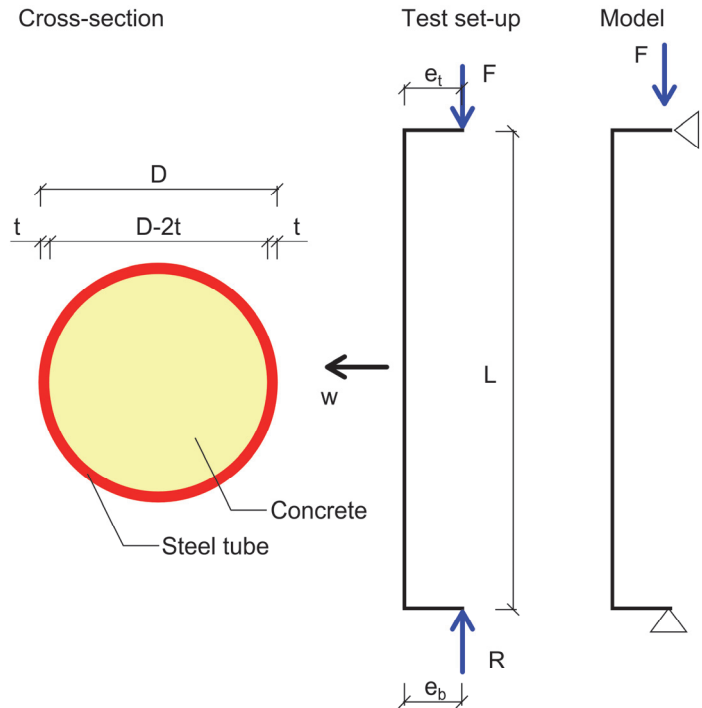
Geometry, cross-section, and the loading of concrete-filled steel tubular column.
